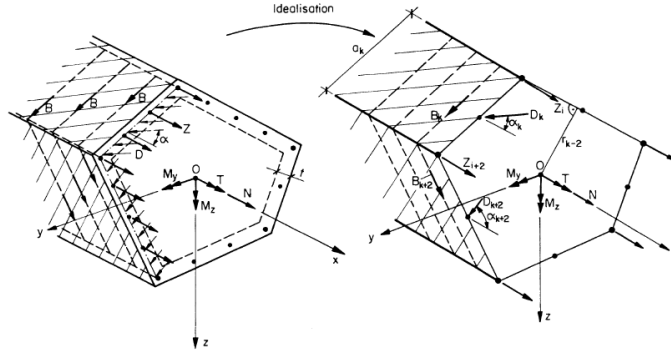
Failure Model - Space Truss with Variable inclinations of the Diagonals (ref [LT72]).
